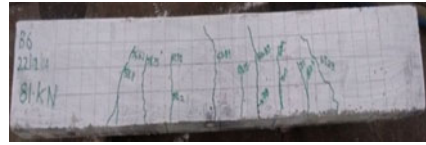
Test set-upFig. 3 Typical crack pattern
